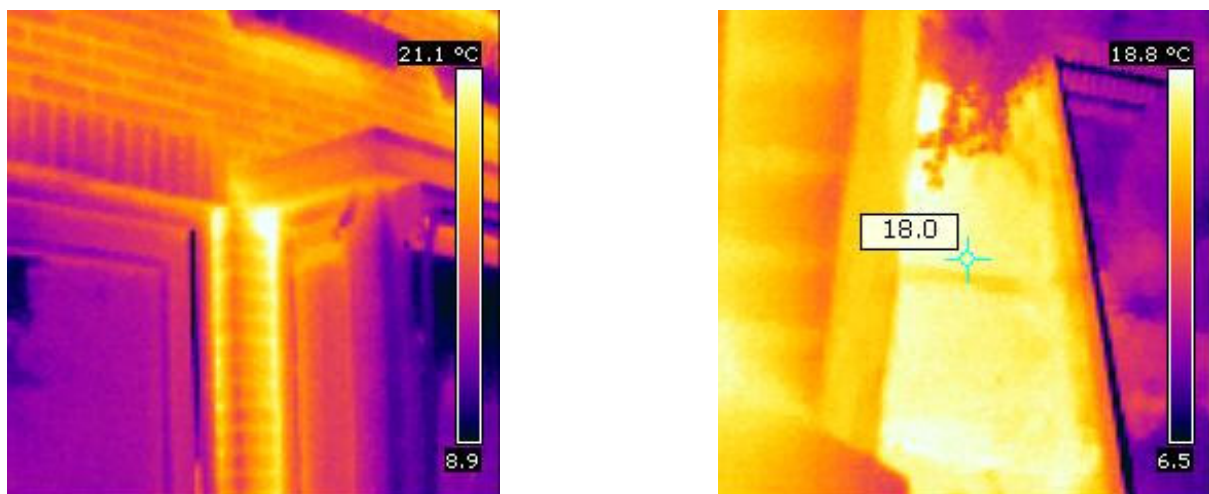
Pictures demonstrating the lower heat resistance of the side and roof of a bay.
